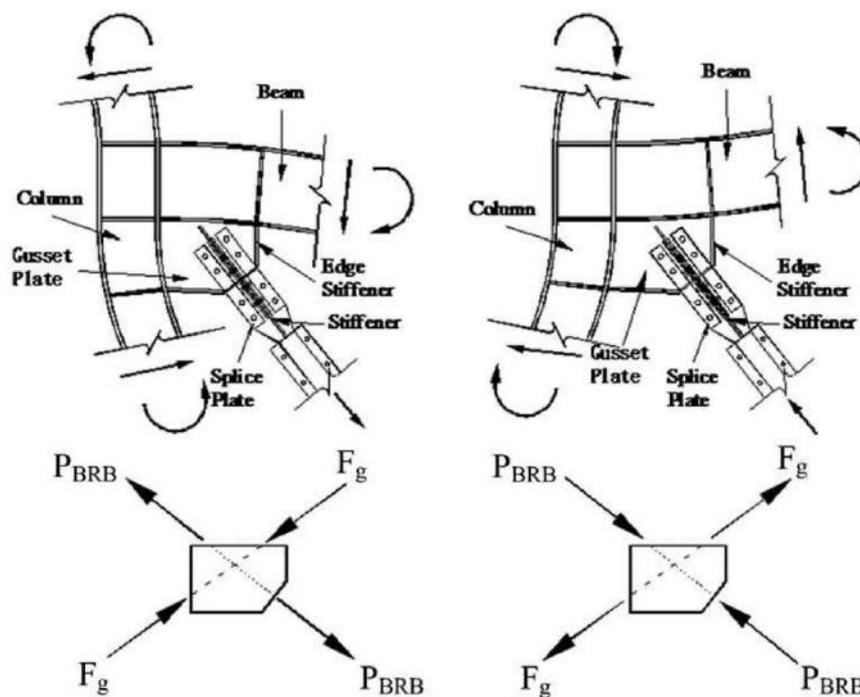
Frame action forces acting on the gusset plate (Chou et al. 2012)
